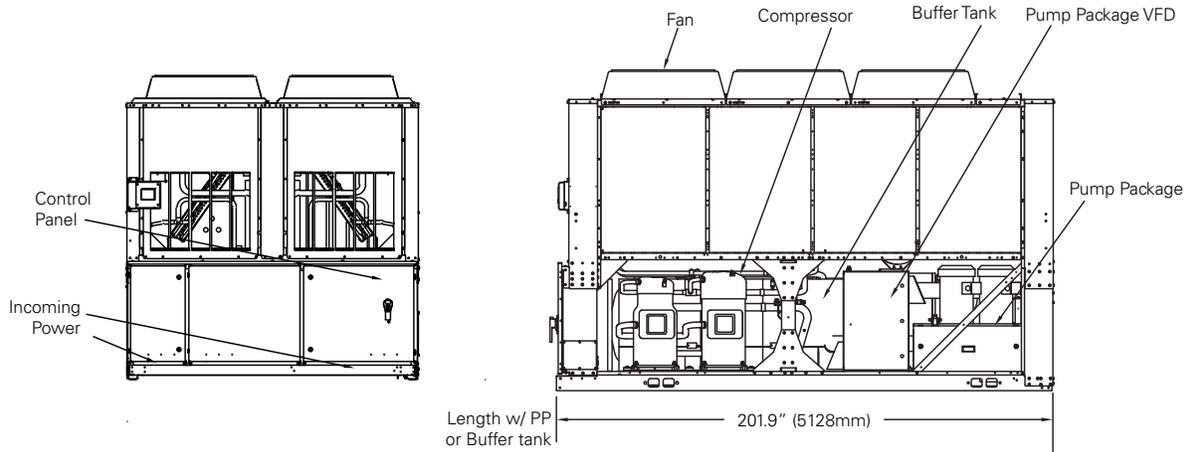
CGAM 100, 110 and 120 ton — pump package, buffer tank, partial heat recovery
